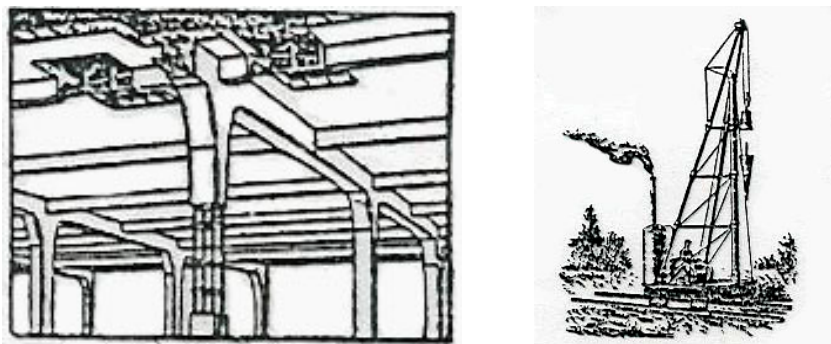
Beam grid-plate a Hennebique's system of a bridge deck
